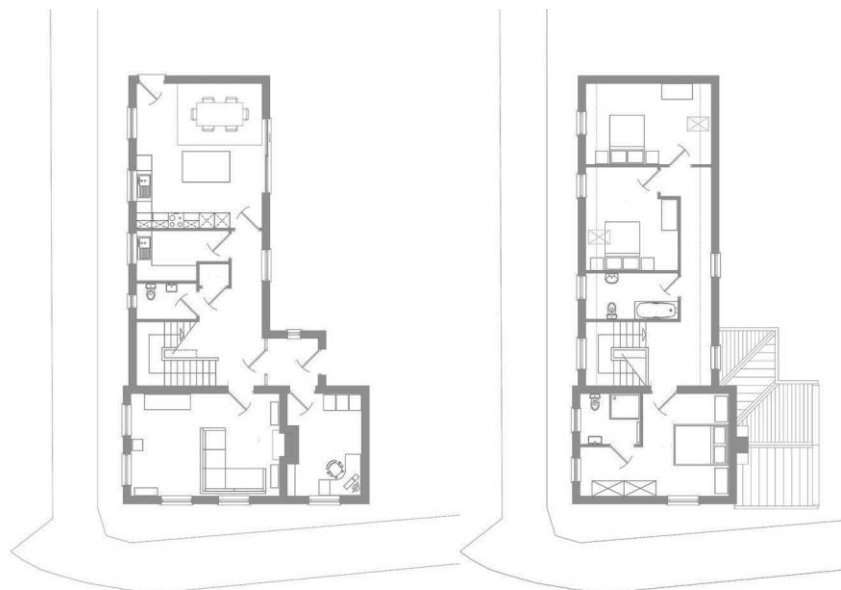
Proposed floorplans; Ground Floor (left) and First Floor (Right)
